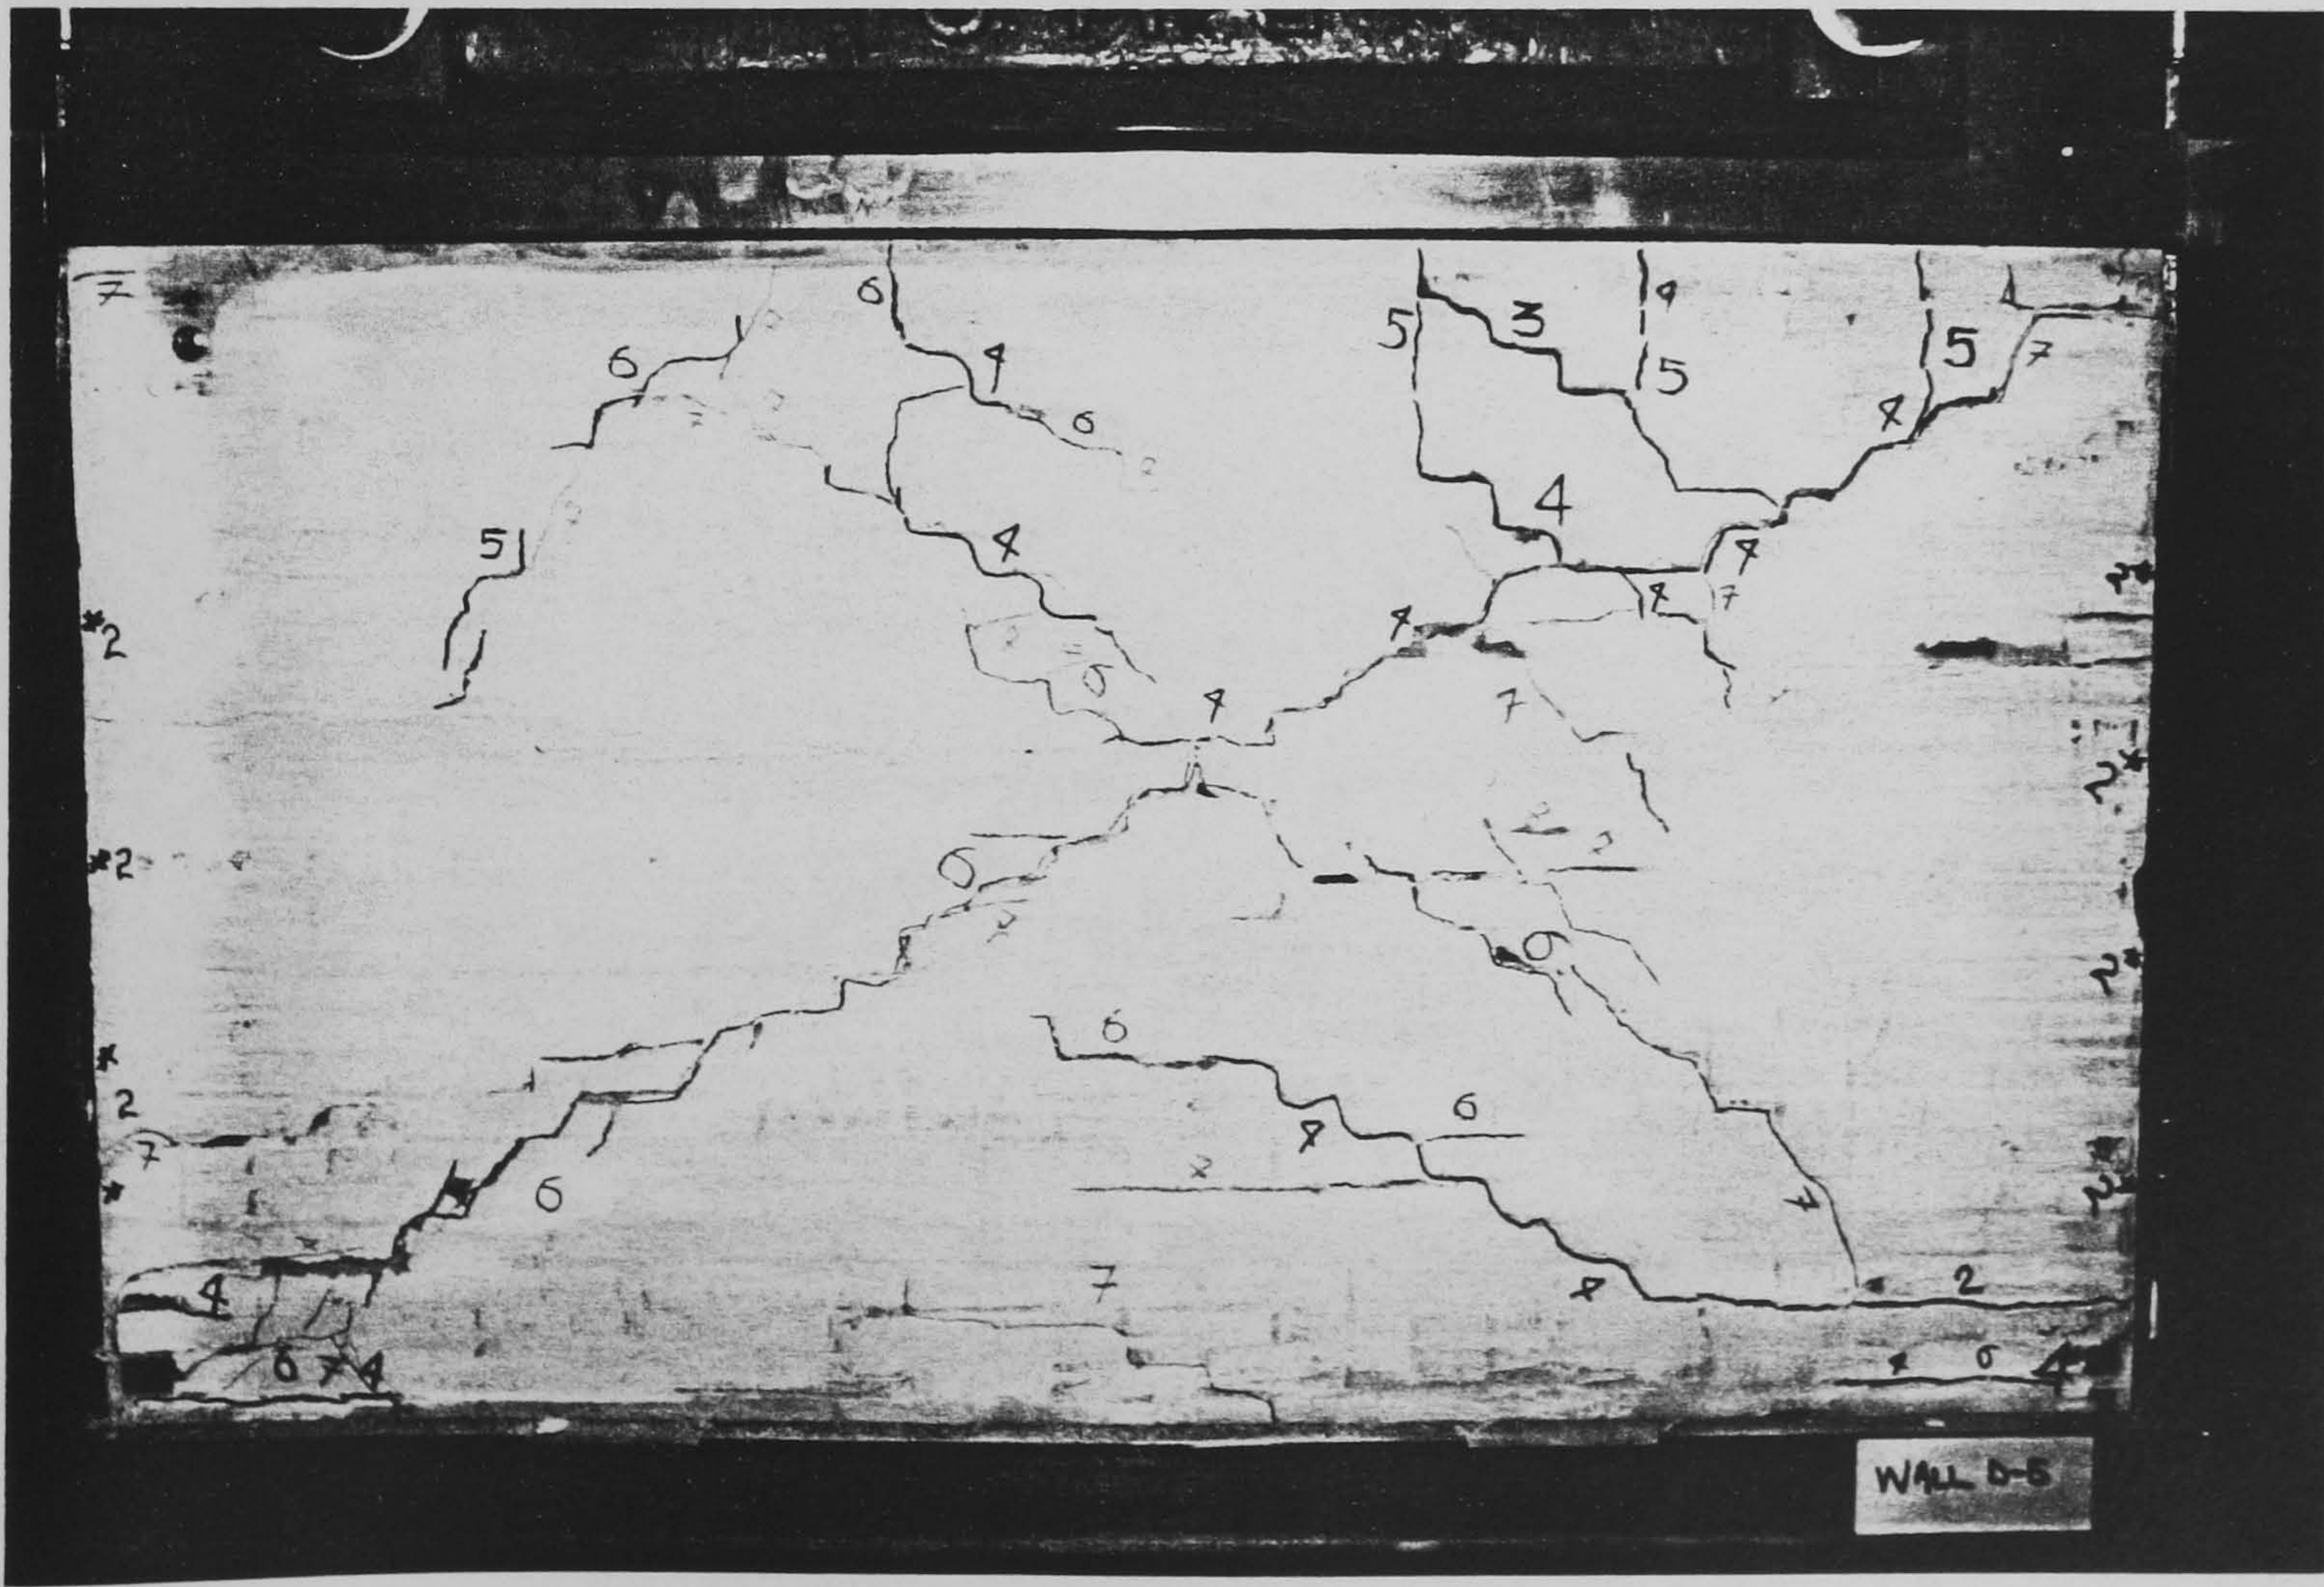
Crack 7 and formation of second diagonal crack (wall-D)
